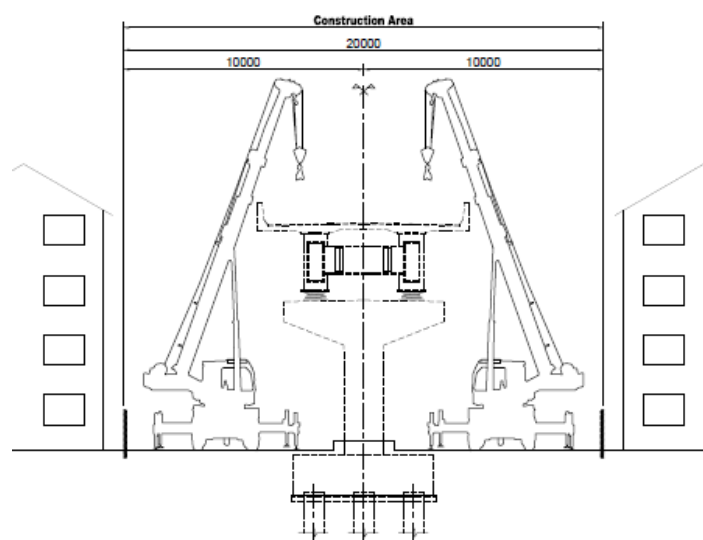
Construction Image between Tripreswar Intersection and Mitighar Intersection
